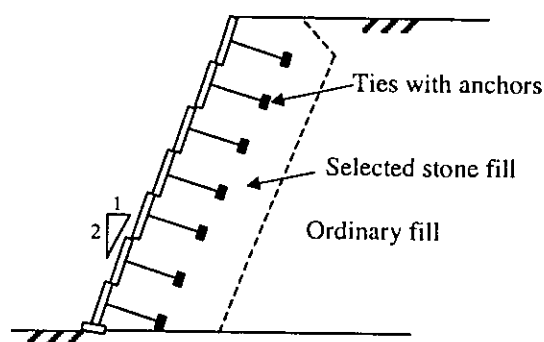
Coyne's Ladder Wall Patented in 1929
